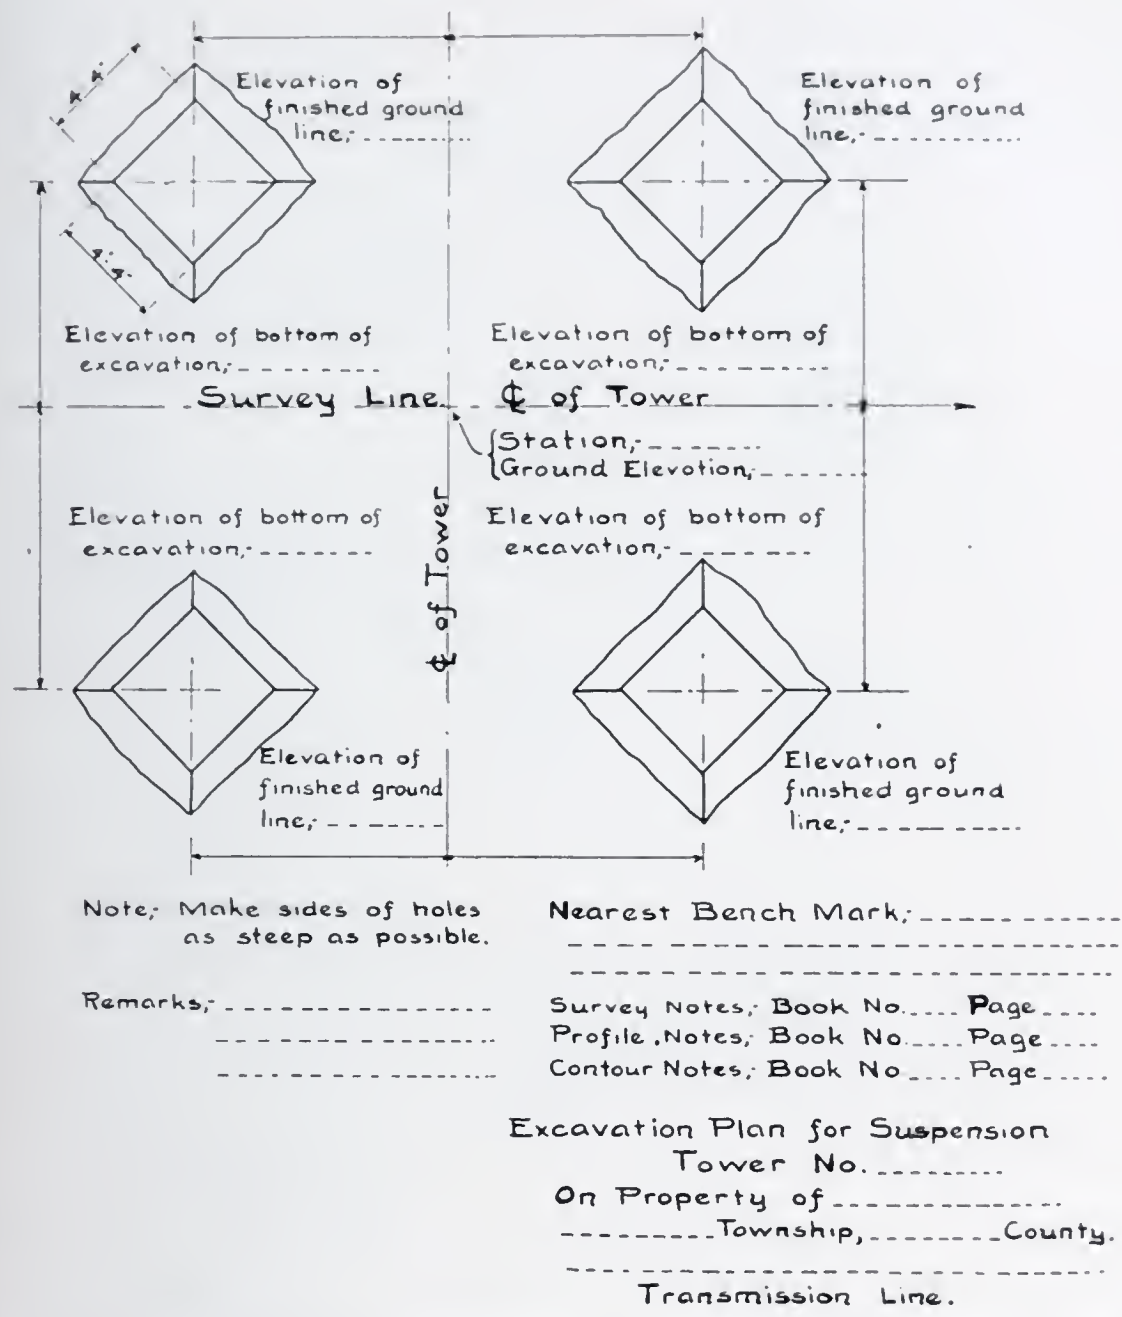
Sample Blank Excavation Plan for Suspension Tower.
